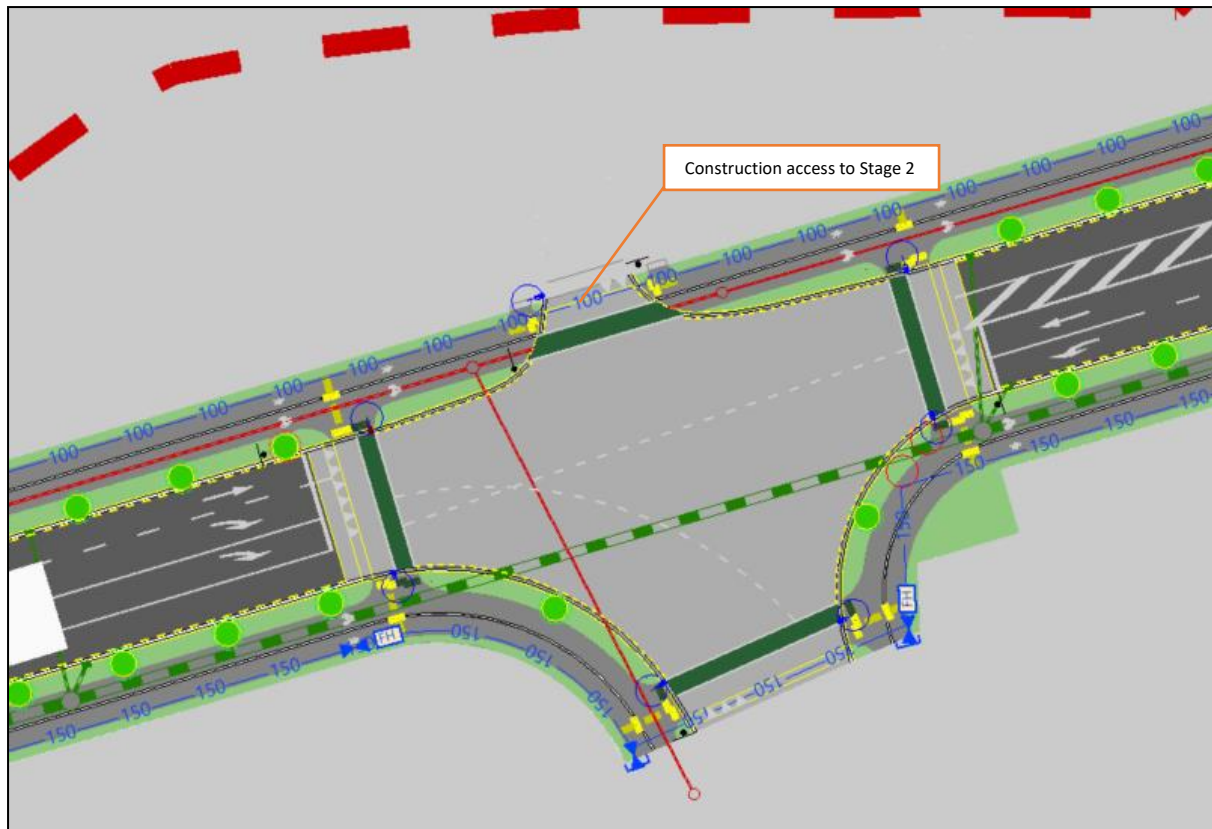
ROAD 3/ROAD 1 CONSENTED INTERSECTION DESIGN
